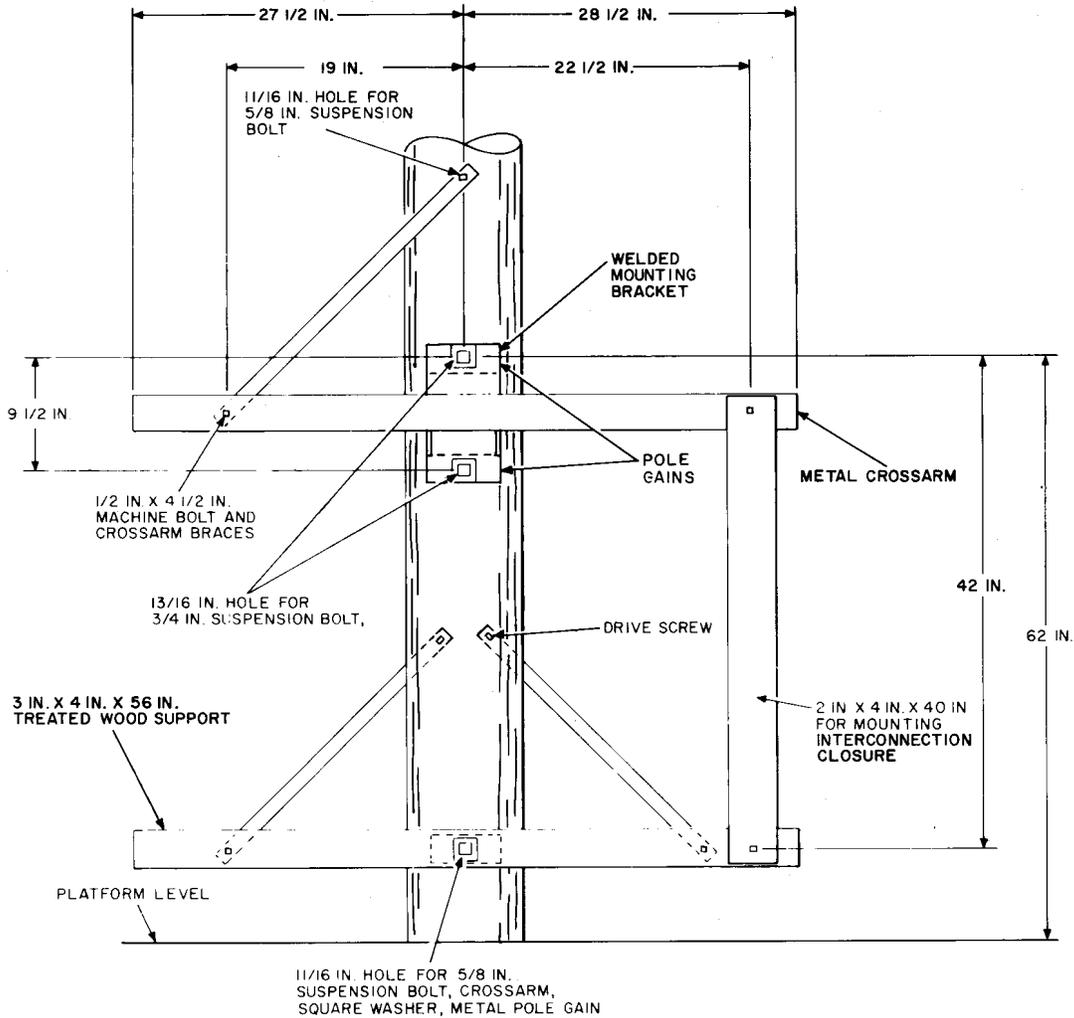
AT-8783B Metal Crossarm For Mounting One RT Cabinet
